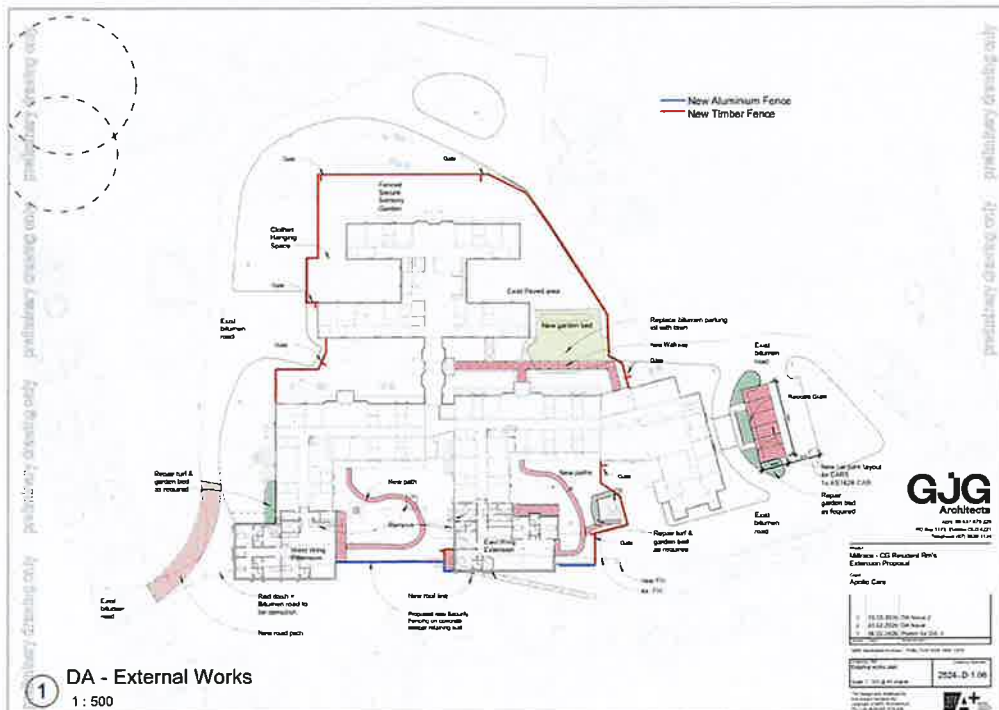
Excerpt of the proposed External Works/Landscape Plans
